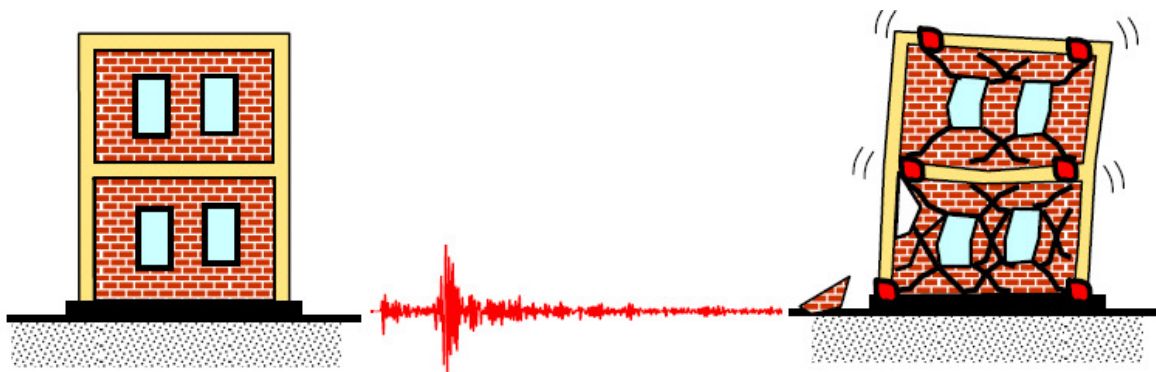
Resistant and NOT Earthquake-Proof: Damage is expected during an earthquake in normal constructions (a) undamaged building, and (b) damaged building.
